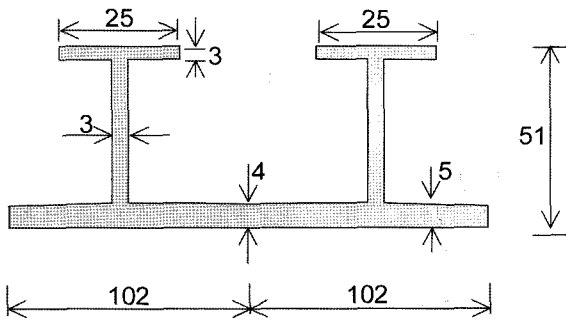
Approximate cross-sectional dimensions of FRP plank (mm)
